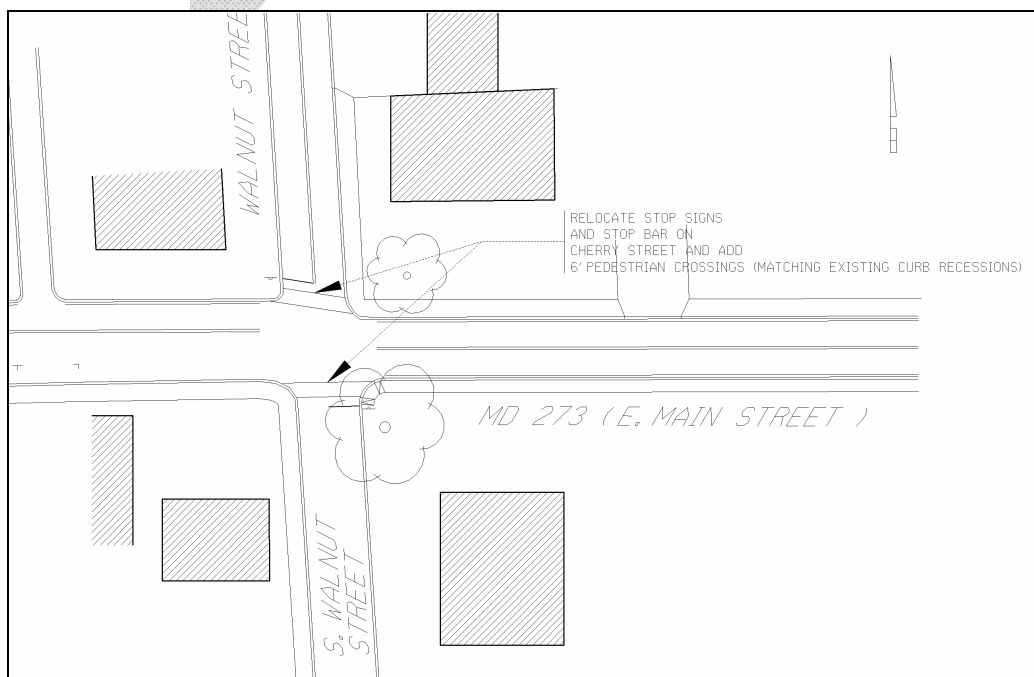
Crosswalk enhancements along Cherry Street & Walnut Street
